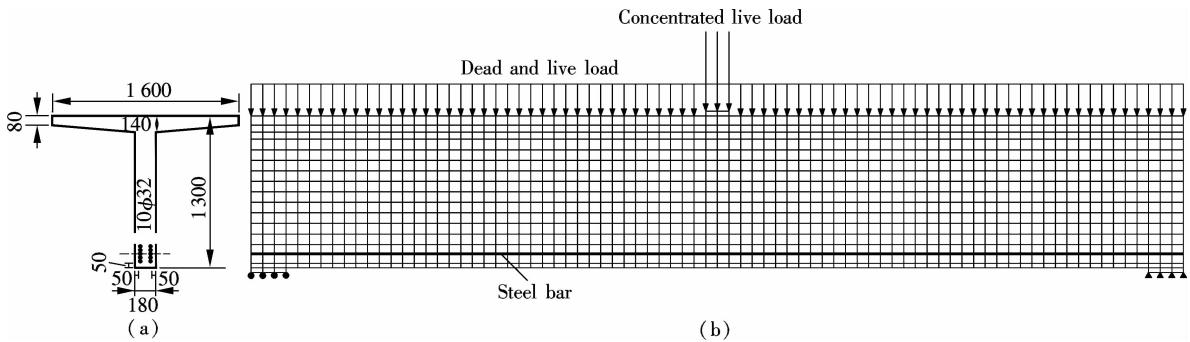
Reinforced concrete bridge beam. (a) Cross section (unit: mm); (b) 2-D finite element mesh of the beam
